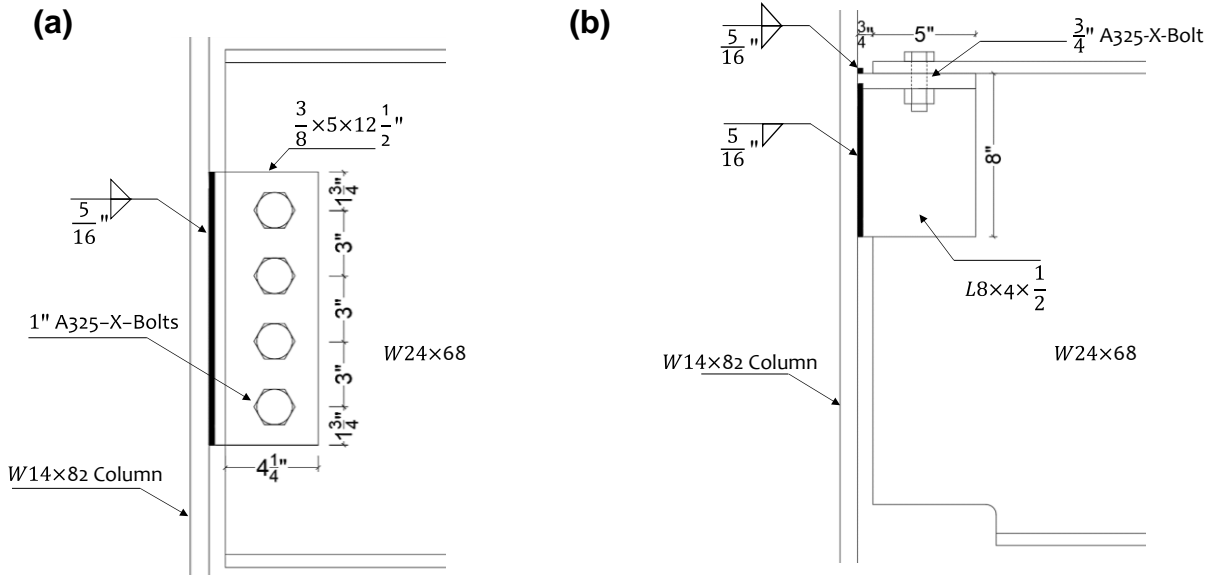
W24x68 Benchmark Designs for a Girder-Column (a) Shear Tab Connection and (b) Drop-In Connection
